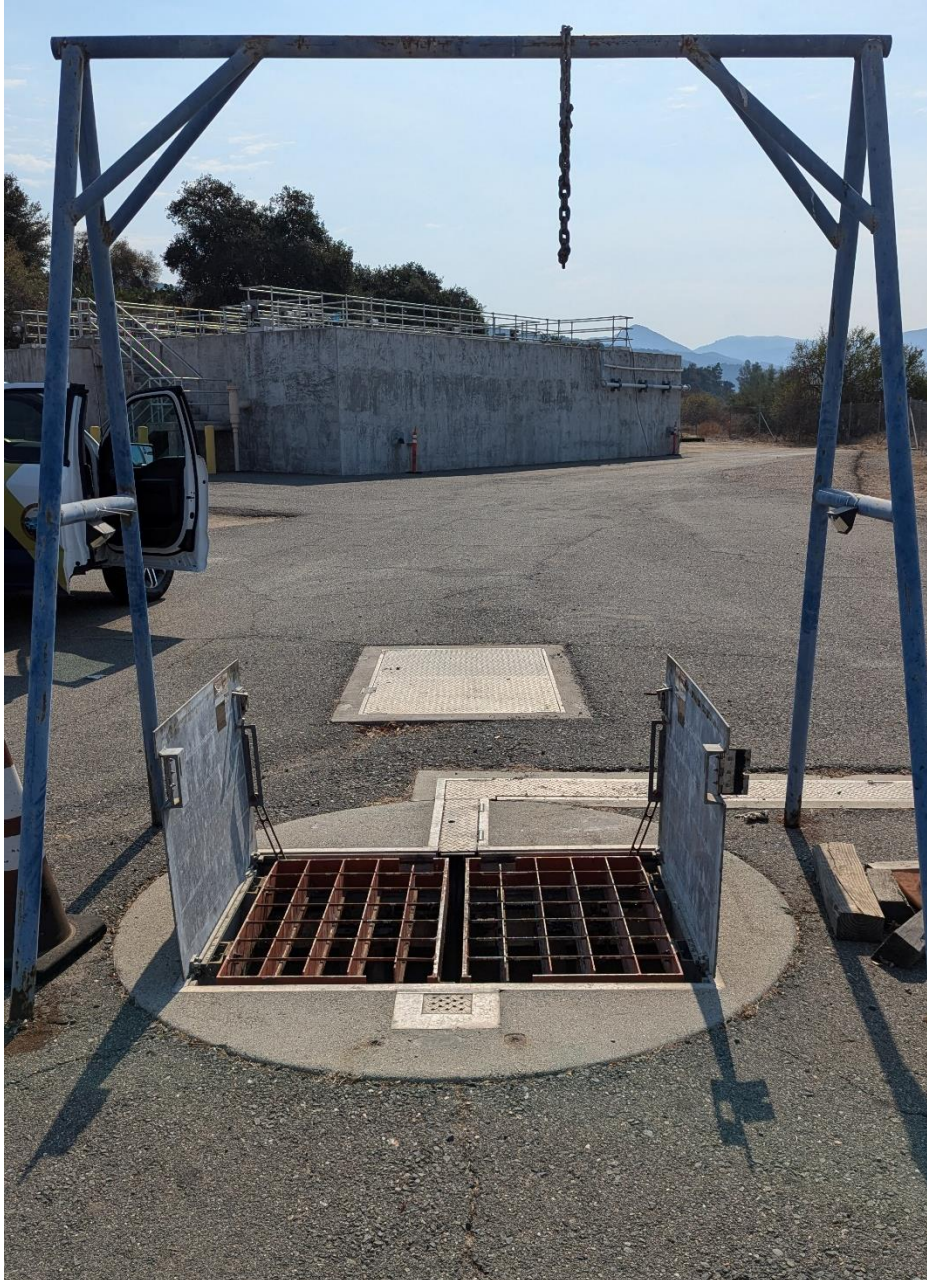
Wastewater Treatment Plant Lift Station - Overview
